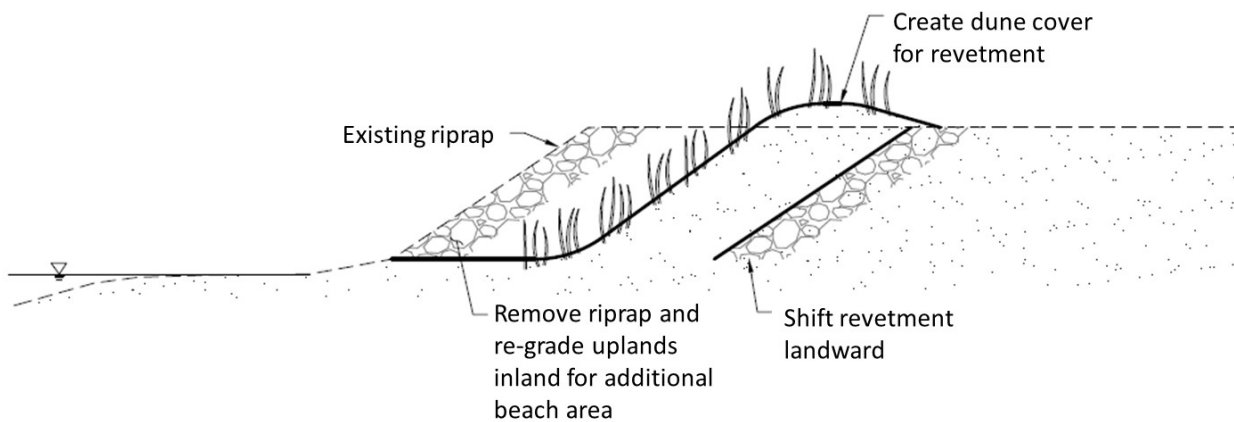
Intervention 5 reinforced dune conceptual cross-section
